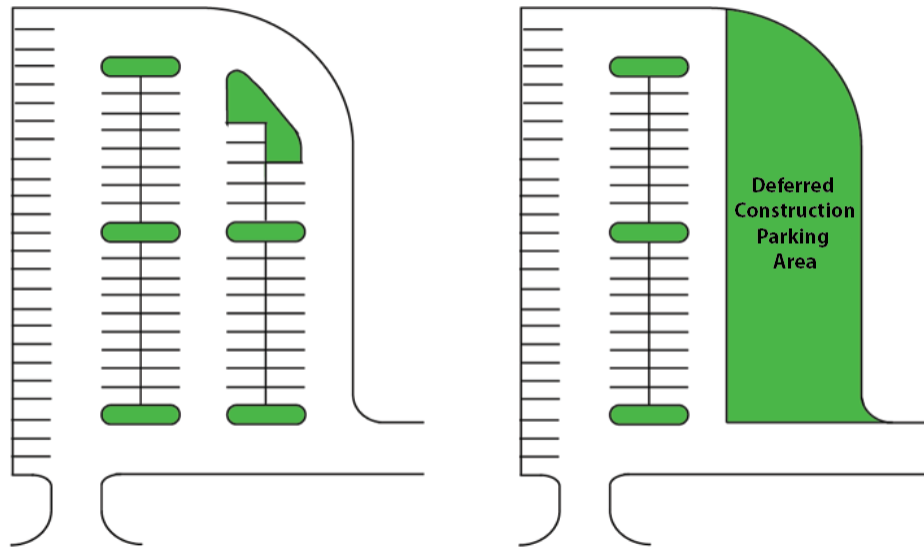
A: The parking lot shown on the left is a traditional parking lot with interior parking islands while the parking lot on the right illustrates where an area is unimproved but is designated for future parking spaces if the demand arises.
